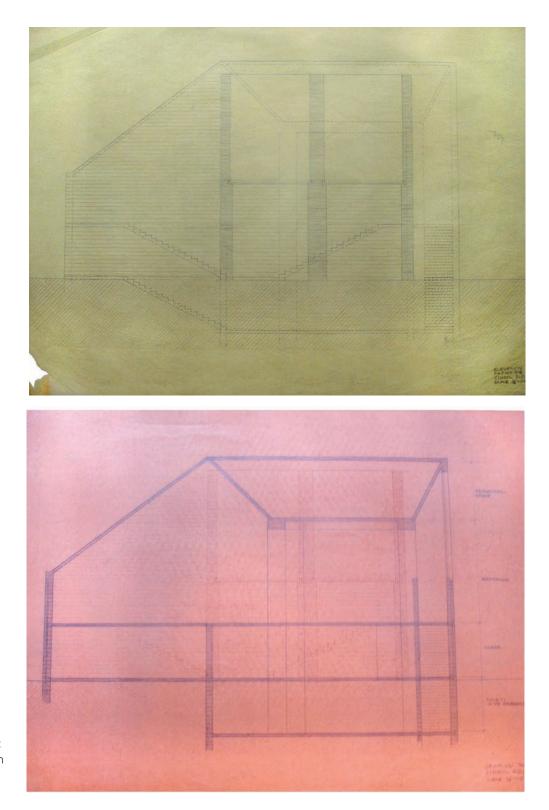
School/Auditorium: Elevation + Section Summer/Fall 1968
